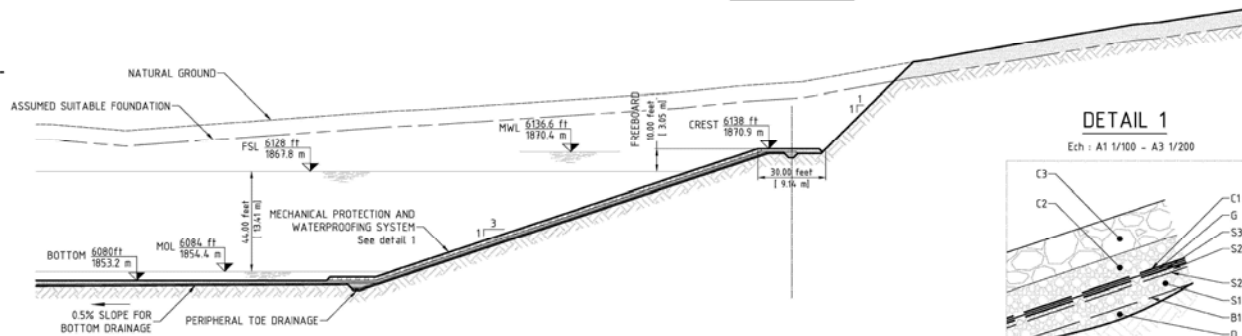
WATERPROOFING SYSTEM DESCRIPTION
